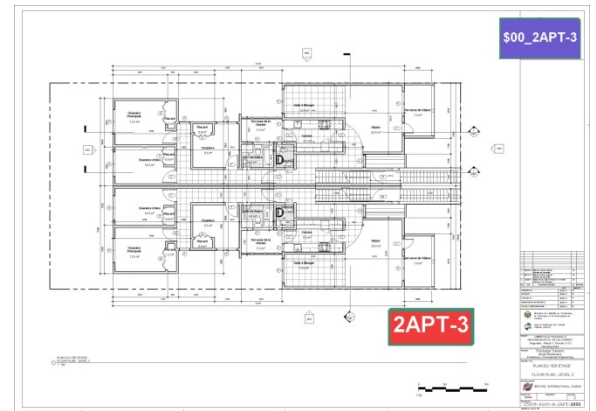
Sheet 25608-PL00-A-2APT-3303 – Floor Plan Level 2 for the 2APT-3 Building Type
